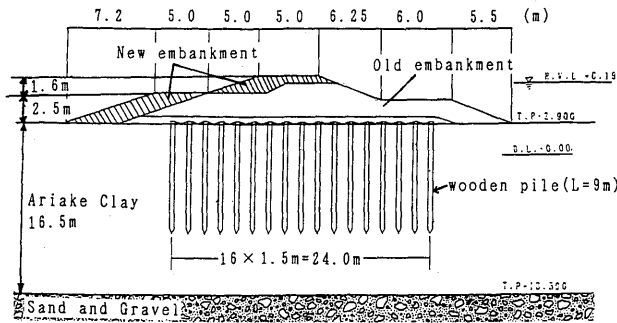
Cross section of pile net method at Kutsugu district in the Saga Plain (25K/100)
